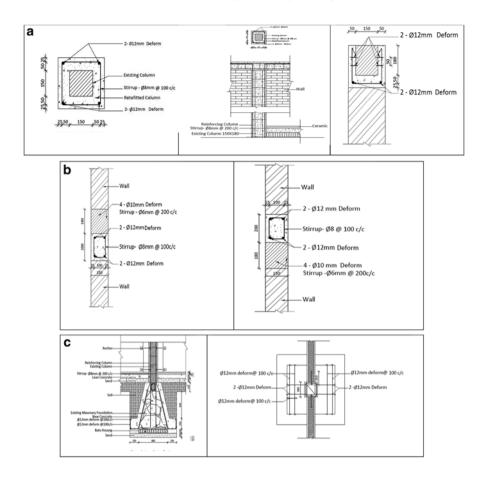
Retrofitting detail. (a) Column and column wall retrofitting. (b) Beam retrofitting. (c) Foundation retrofitting. *Source*: Shrestha et al. (2012)
